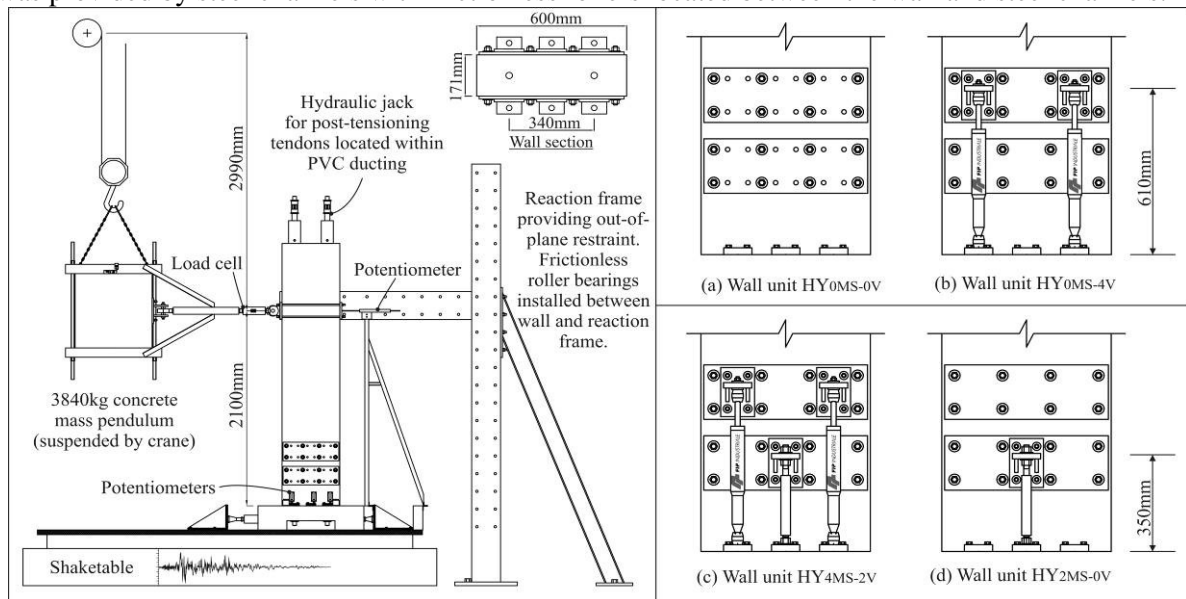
Shake-table set up (left) and precast wall specimens (right (a)-(d))
